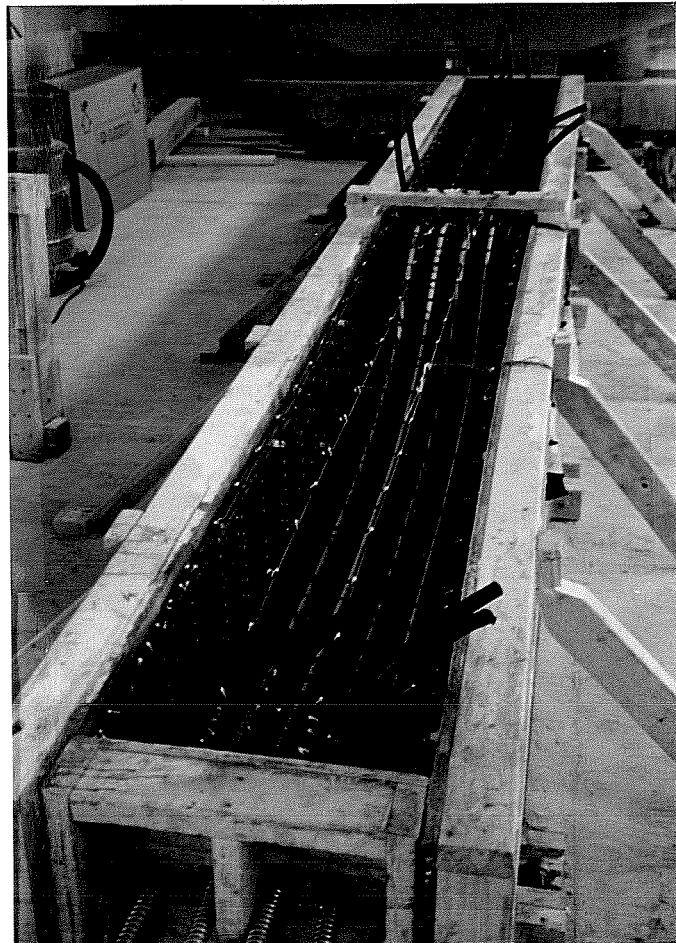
Post-Tensioning Duct Secured in Formwork before Placement of Concrete
